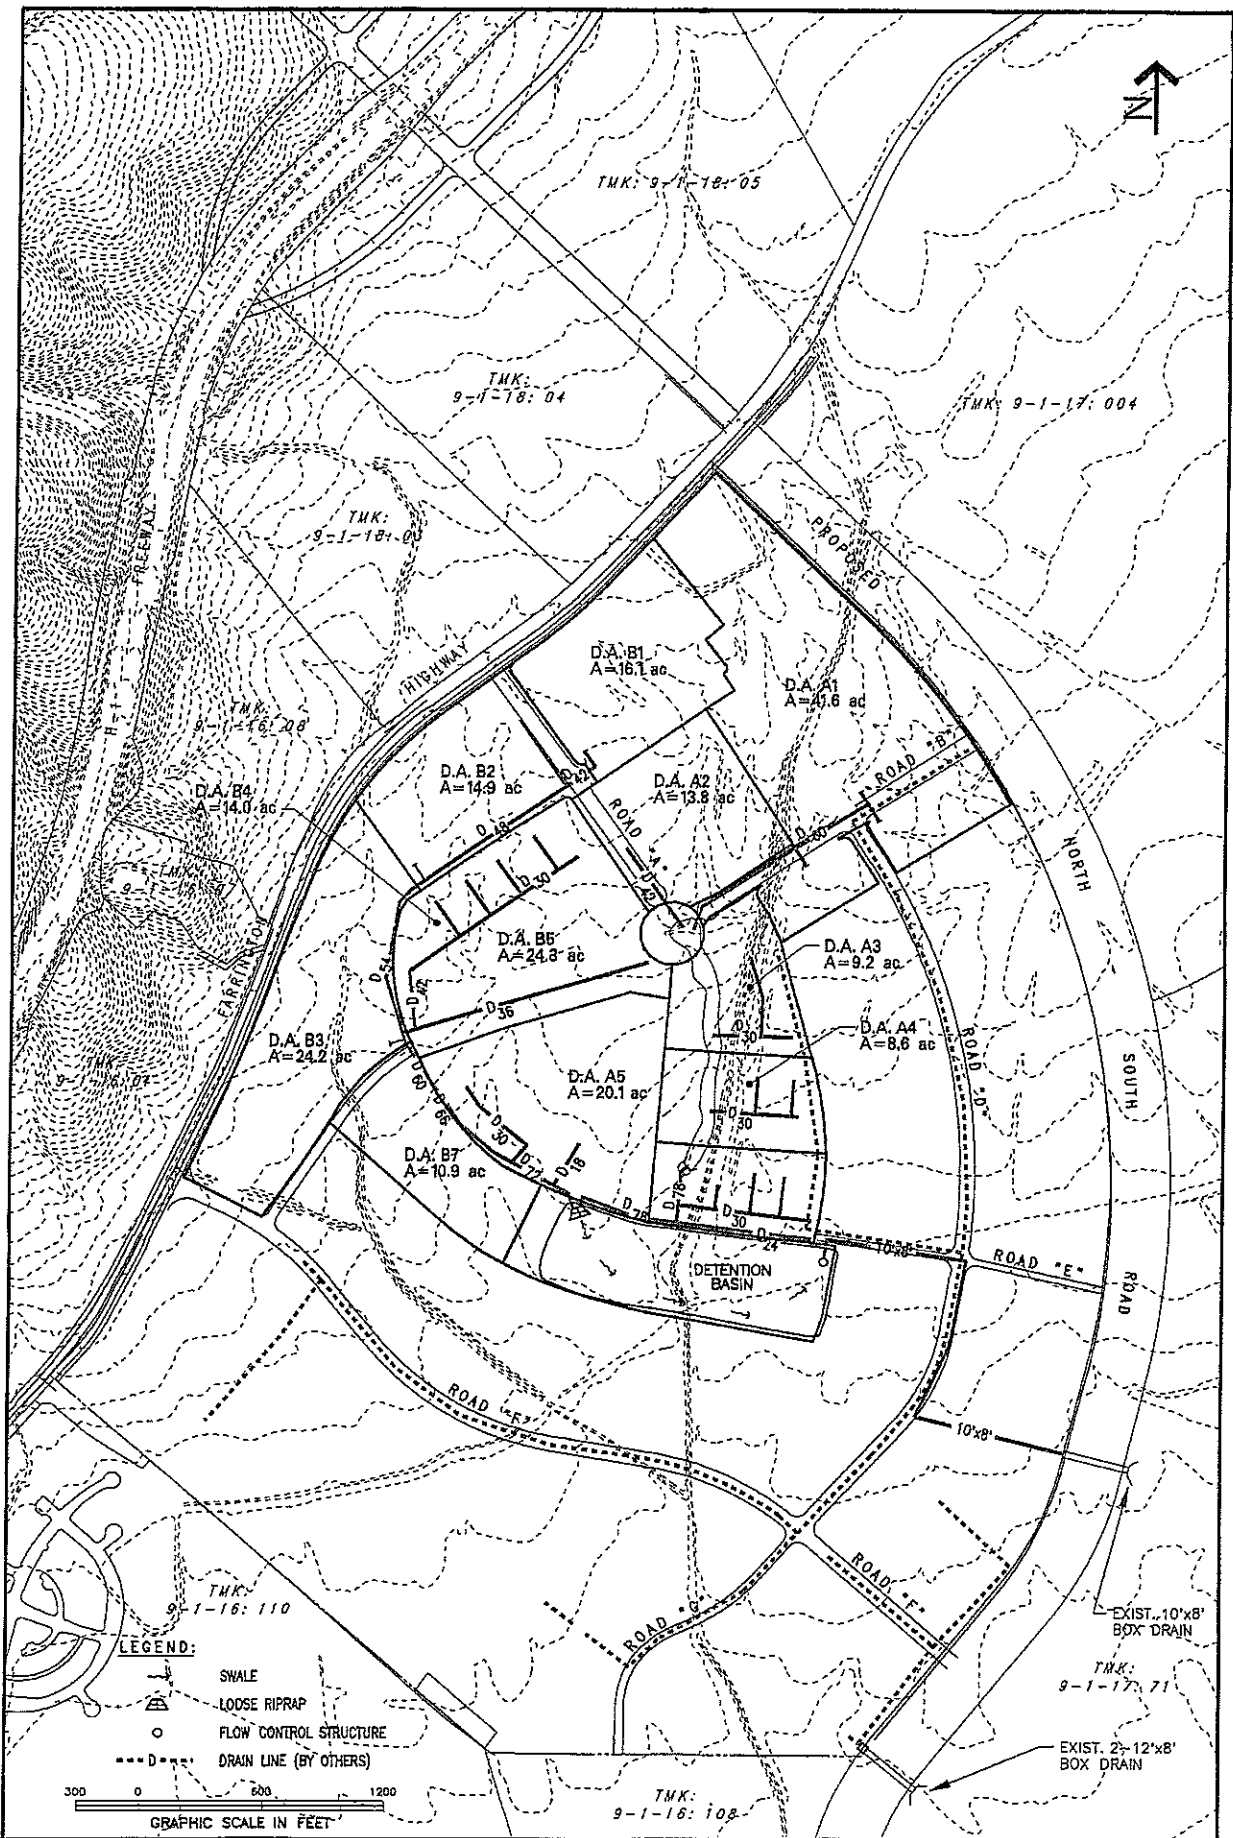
Full Build-Out Campus Onsite Drainage System
